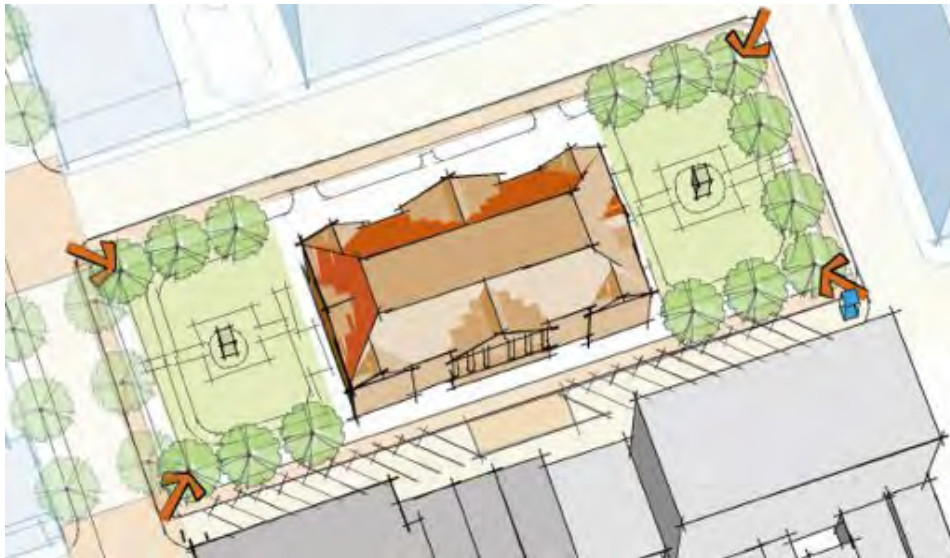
Proposed layout for Province House Grounds (for further details see Design Brief, Figure 3.13)
